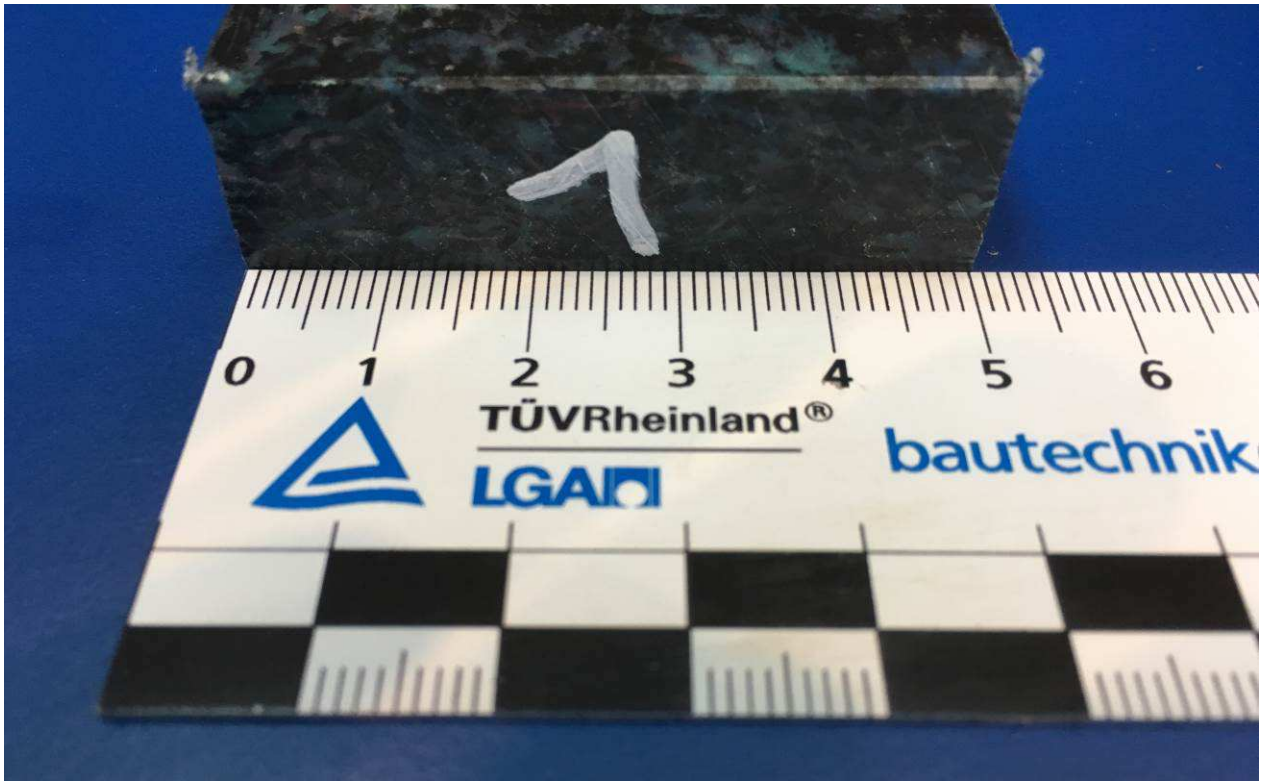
Plate Type 2: Dimensions: 50 mm x 50 mm x 15 mm, test specimen 1
